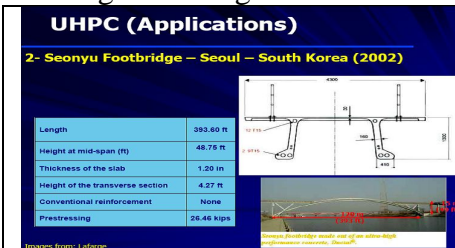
Footbridge in Seoul, South Korea, 2002.
